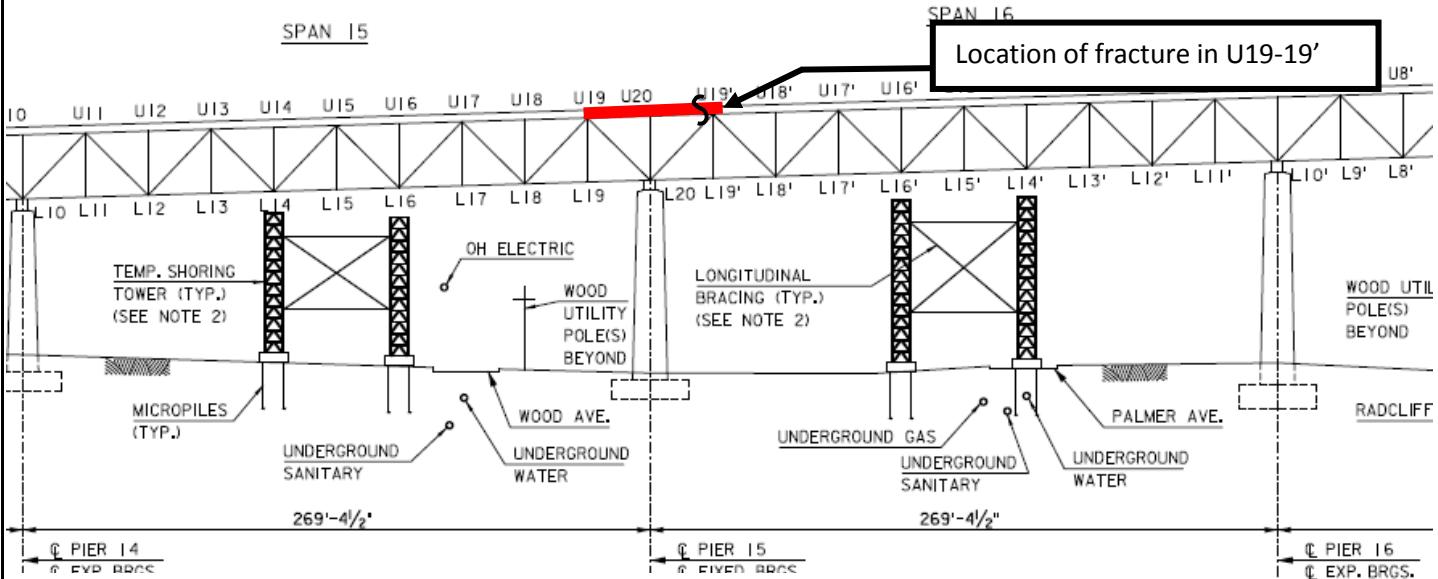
Shoring Tower locations, elevation looking north (HNTB)
